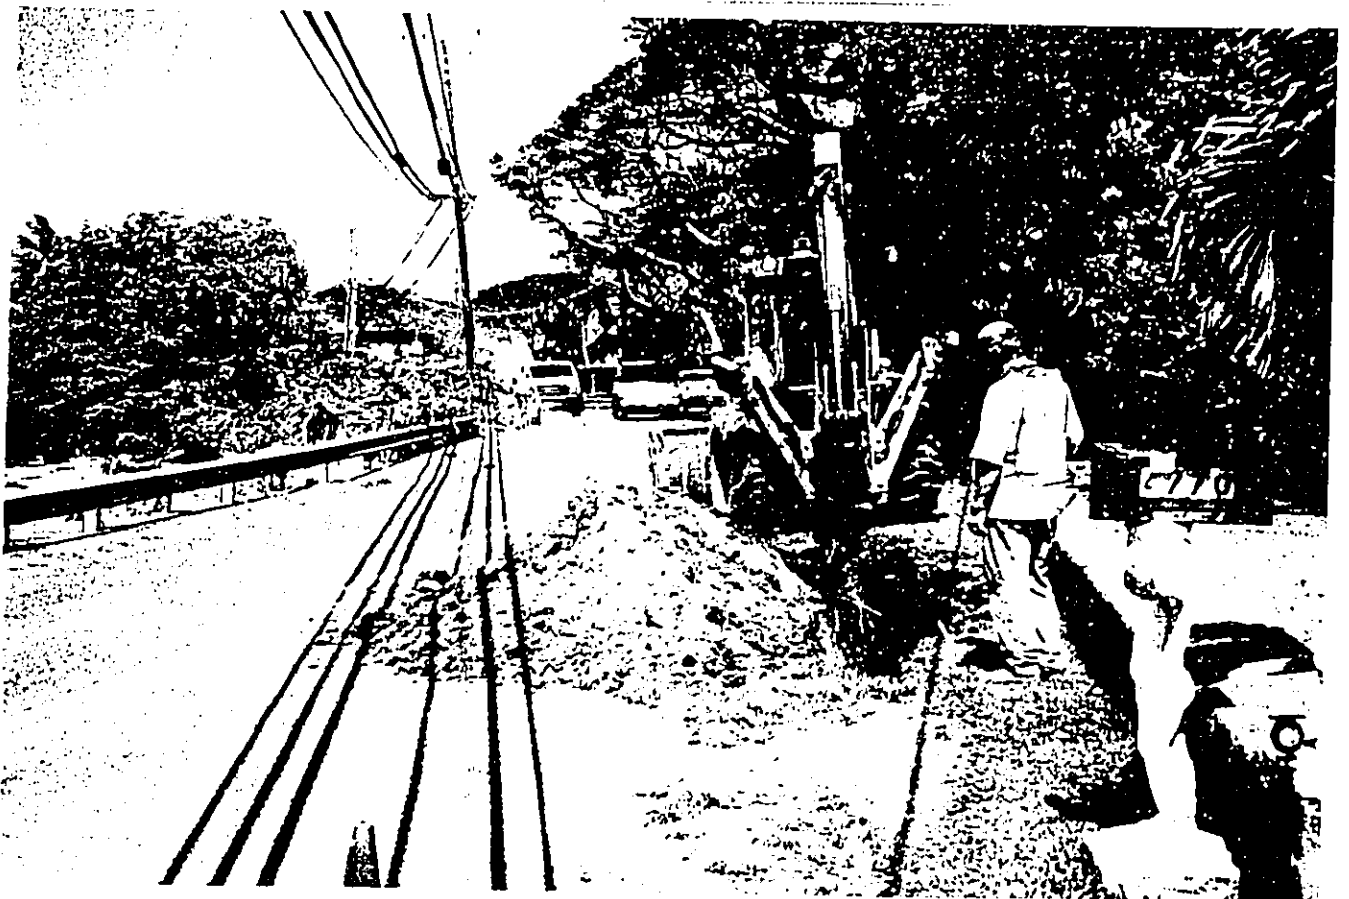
Backhoe Trench 4 being excavated along the roadway.
